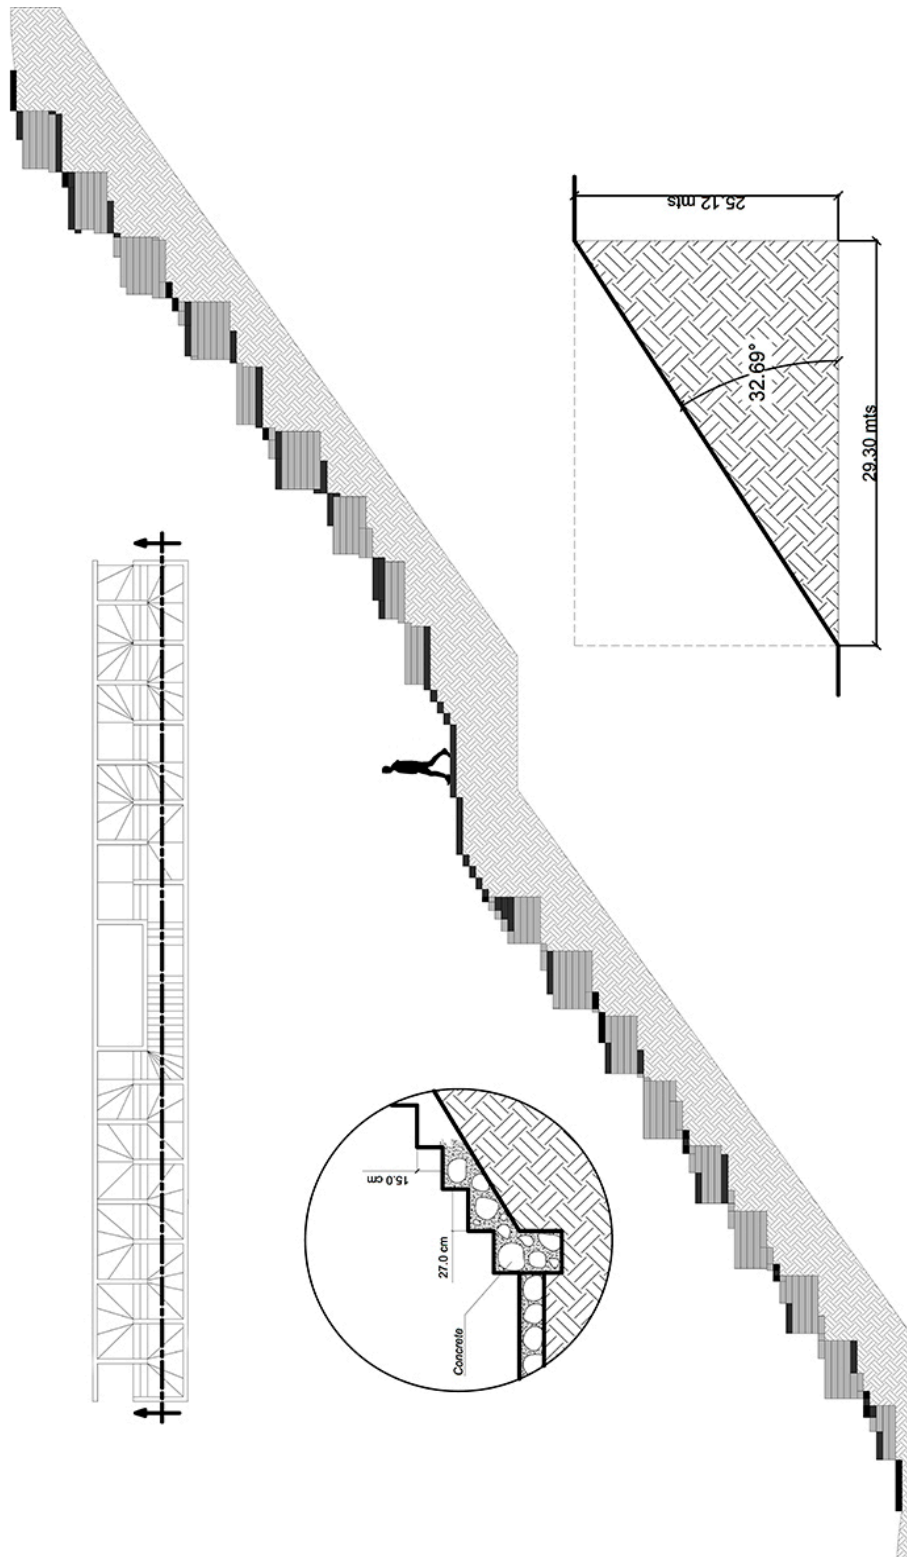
Section of exterior stairs configuration, inclination and construction detail
